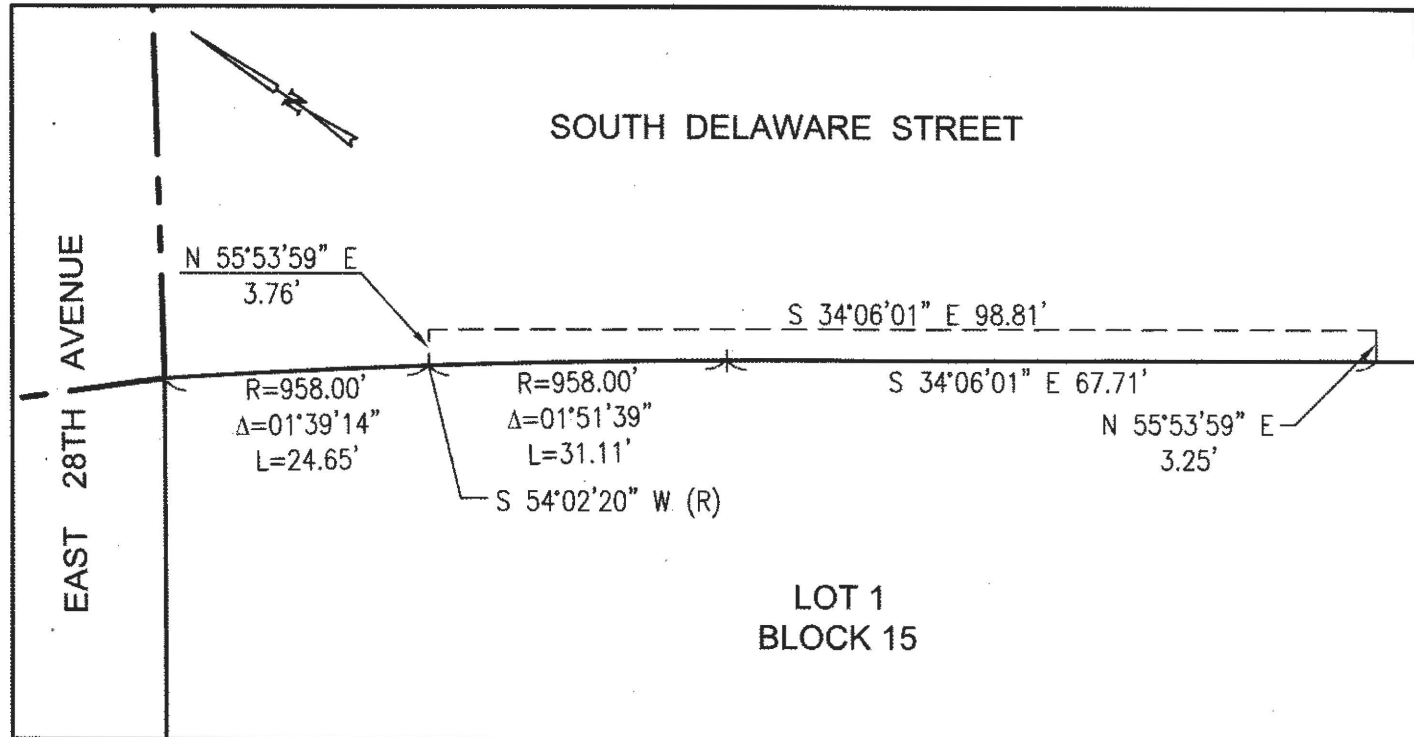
DETAIL 'B' - VERTICAL BUILDING RESERVATION (V.B.R.)
